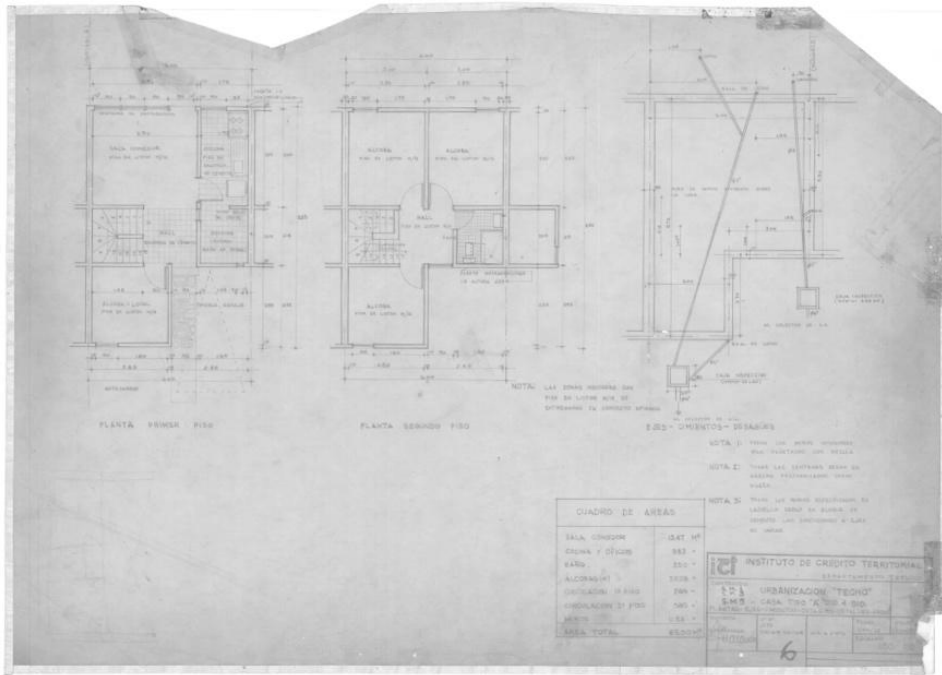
Ground floor and second floor plans of House type A. SM 1, 3, 5. ICT. Archive Minvivienda, La Fragua.
